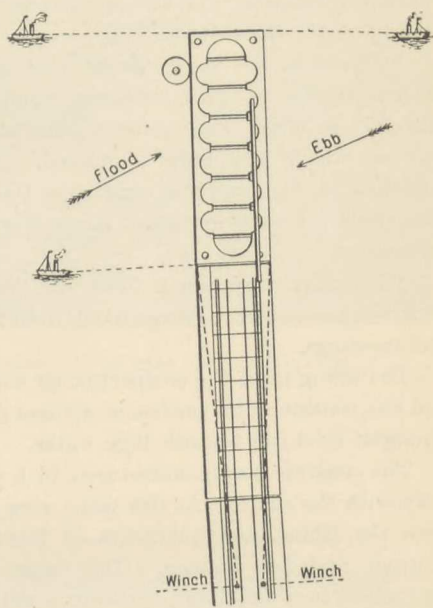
Aligning Caisson, Zeebrugge Harbour Works.
